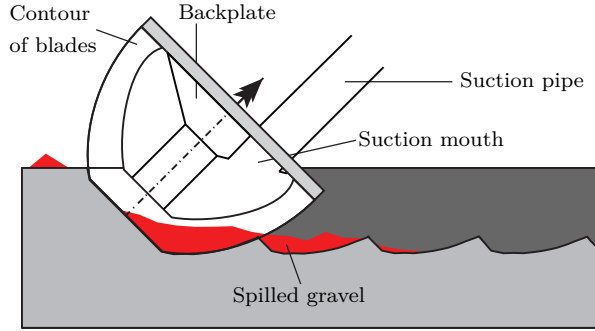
Schematic representation of a cutter head with named parts. The red part shows the spilled gravel after a cutting experiment (Den Burger, 1999).
